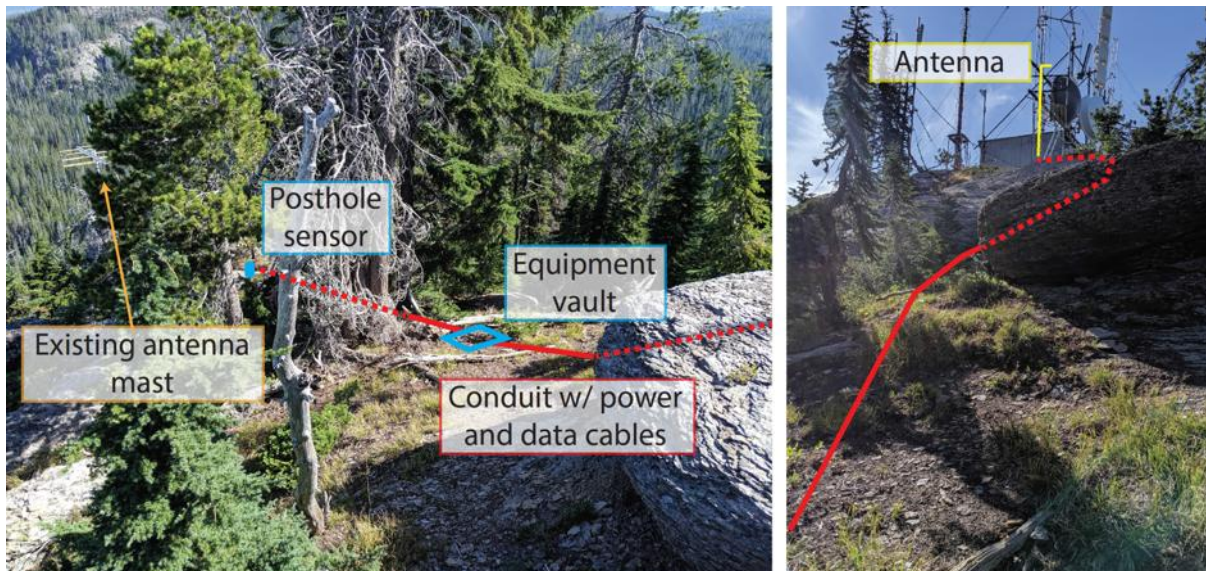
North facing view of seismic station (left), showing the posthole sensor, equipment vault, and conduit locations. The right image shows the conduit run from the equipment vault to the shelter, as well as the proposed location of the antenna.
